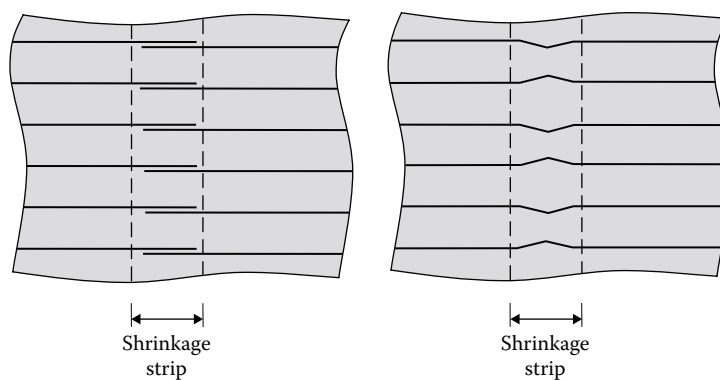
Alternative reinforcement details at shrinkage strips.
